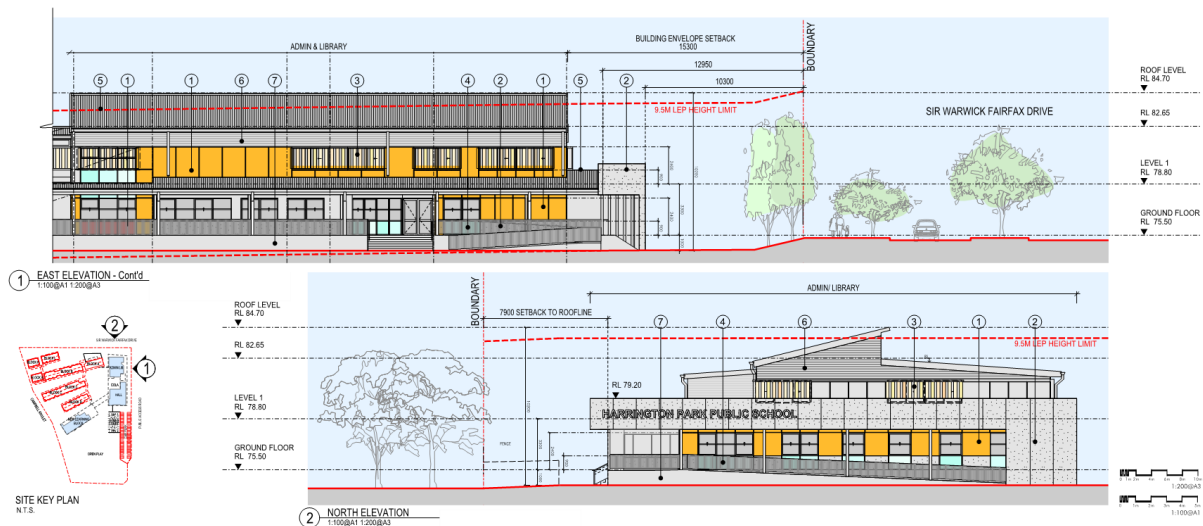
Northern and eastern elevations of proposed Administration/Library Building, 9.5m building height limit indicated by red dotted line (Source: SARM Architects)
